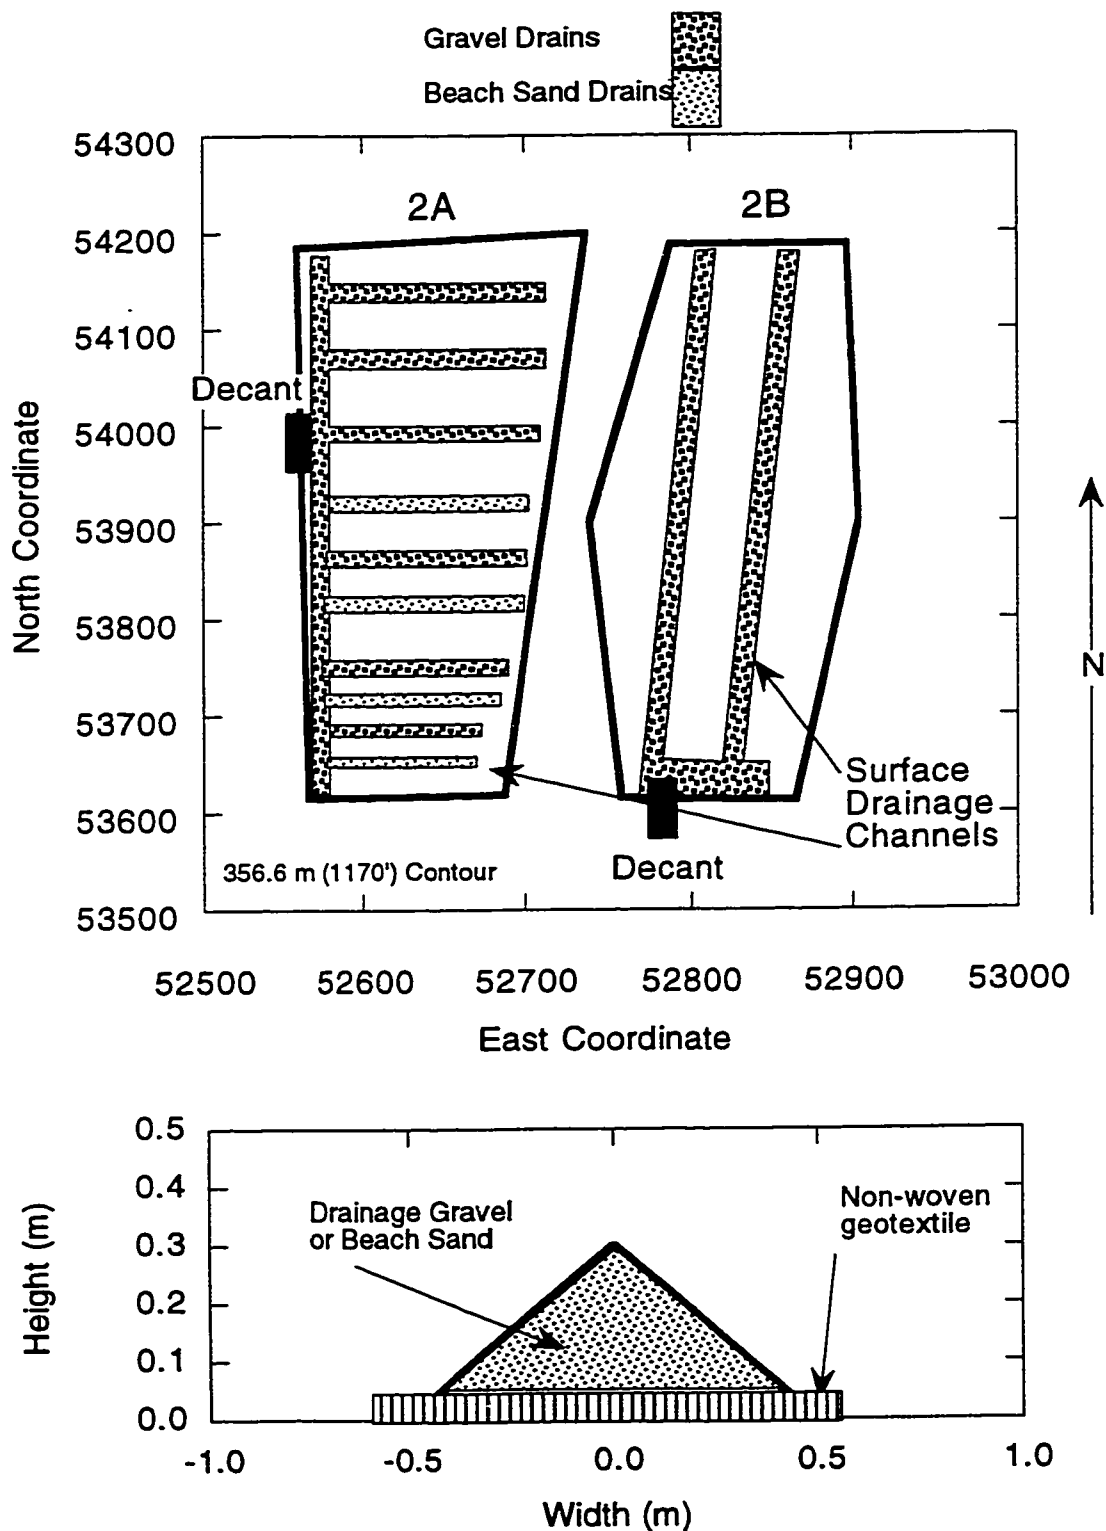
Drainage channel design (a) plan view and (b) cross-section
